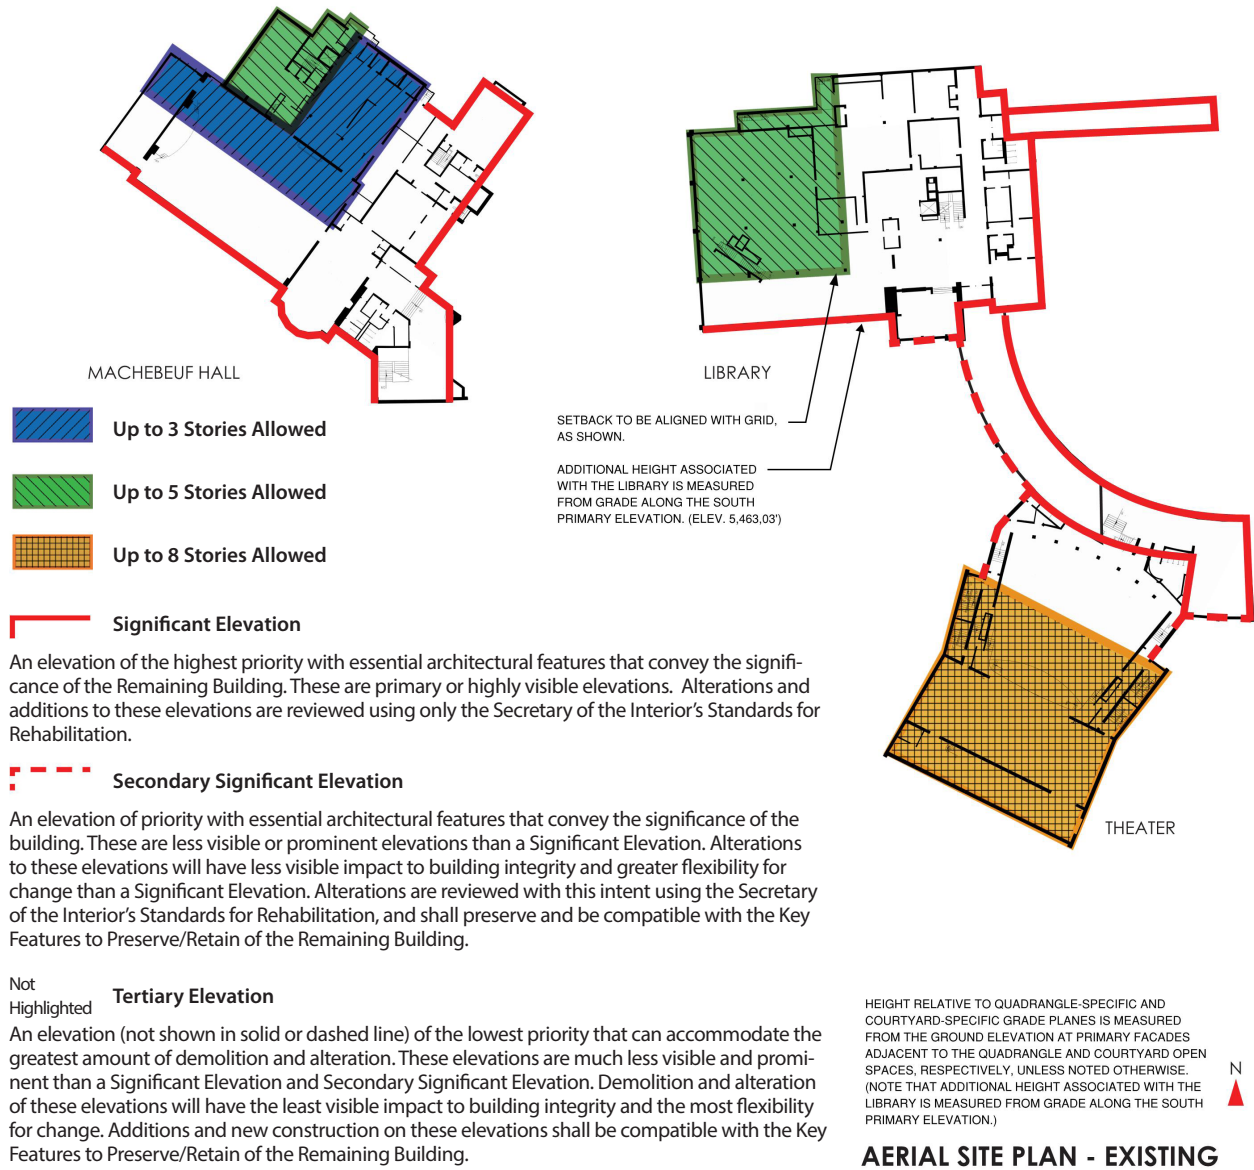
Building Elevations and Potential Addition Locations for Machebeuf Hall and the May Bonfils Stanton Theater & Library
